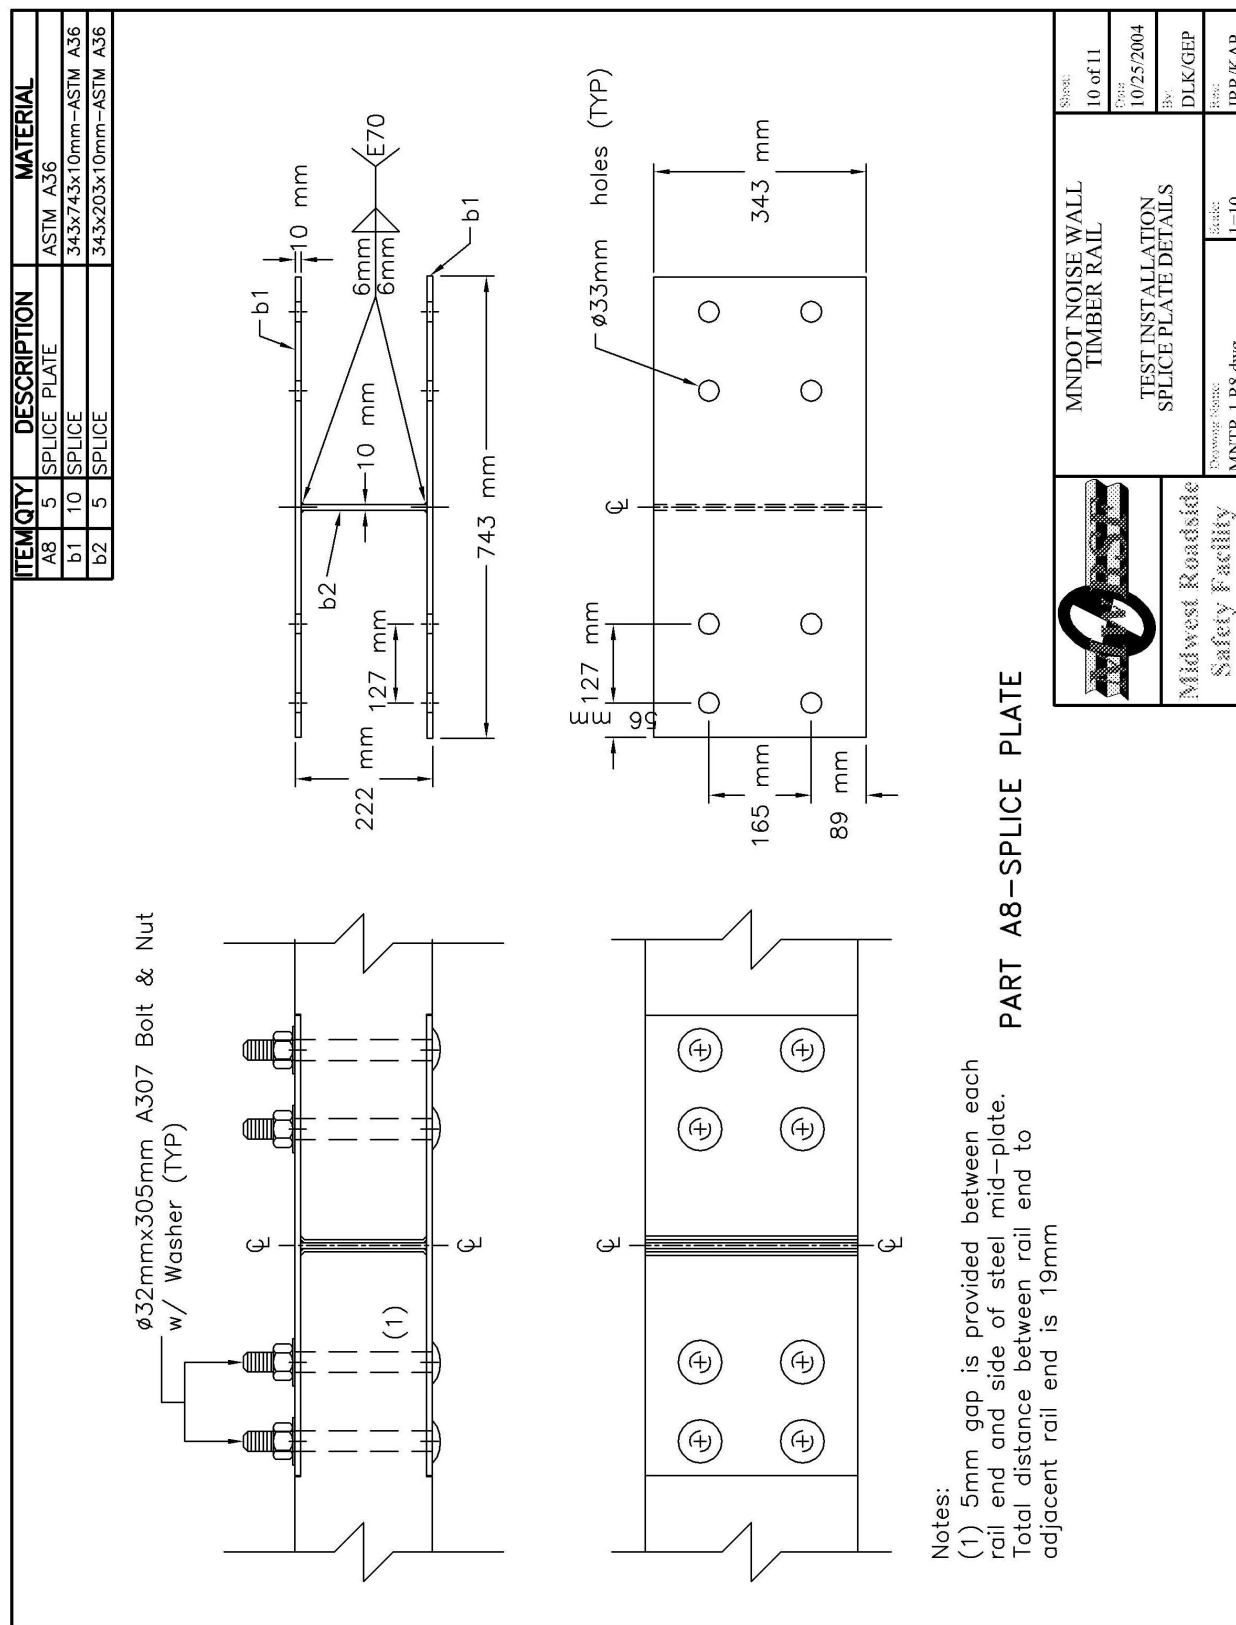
Mn/DOT's Timber Rub Rail Design Splice Plate Details
